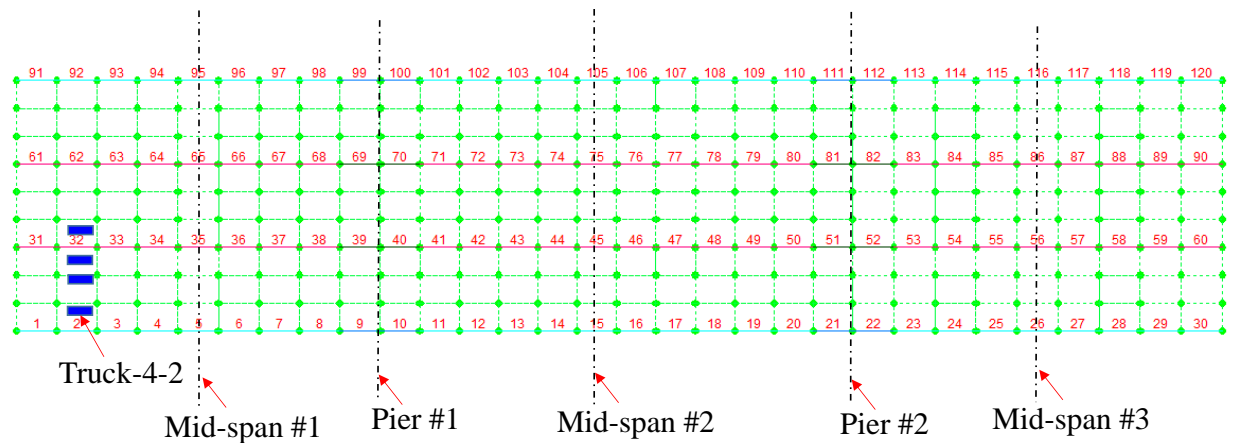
Load case with transverse position 2 feet from bridge barrier rails
